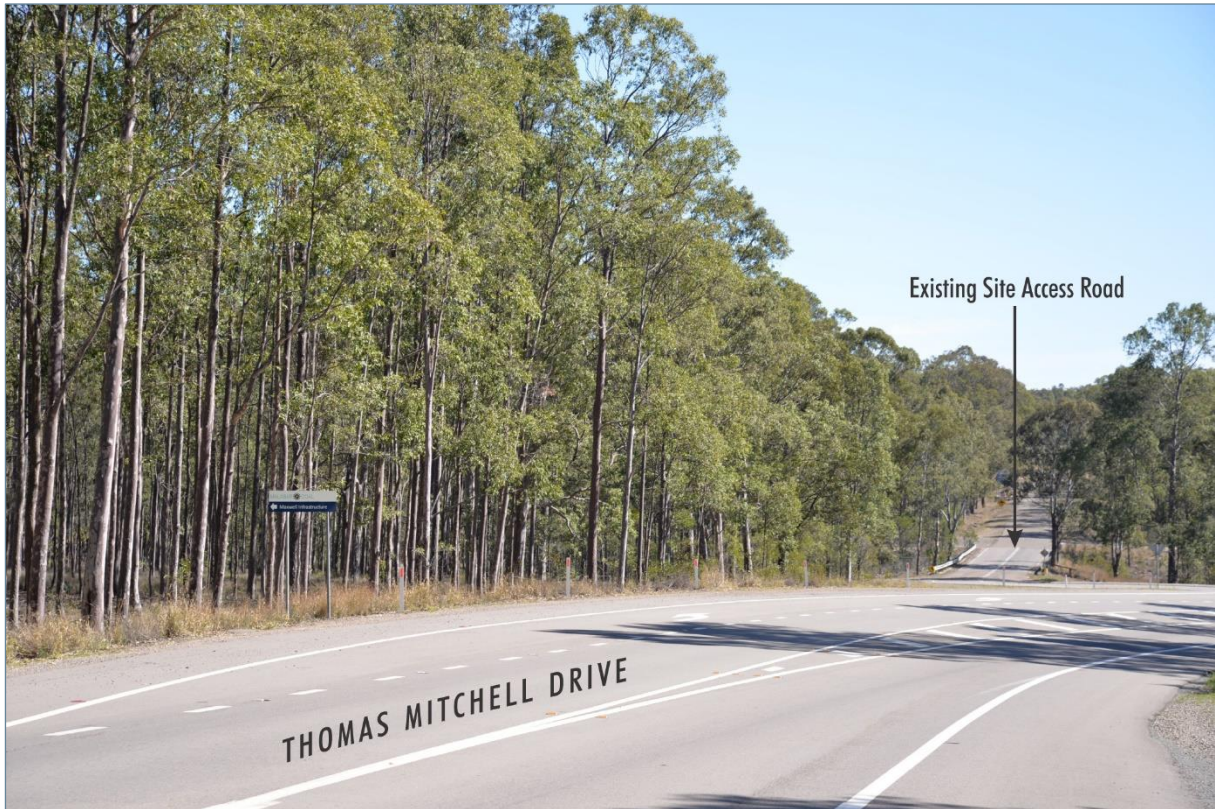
Existing Site Access Road from Thomas Mitchell Drive
